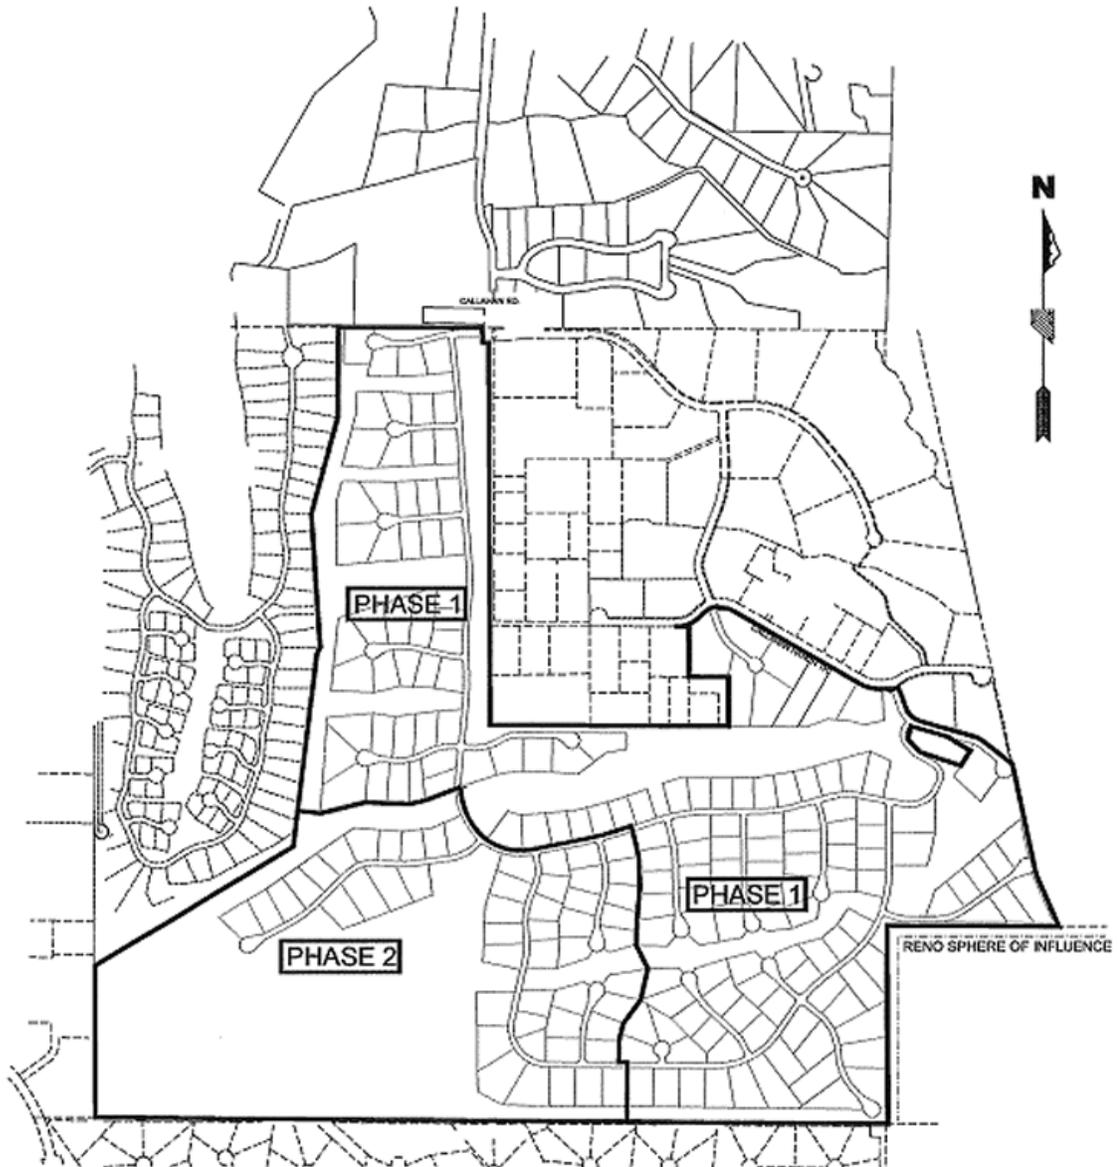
Reynen and Bardis Specific Plan Lot Layout Plan
